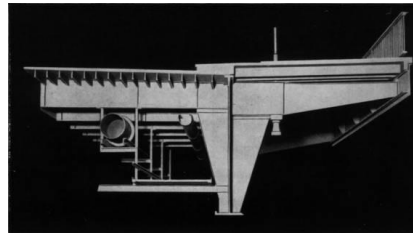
Segment of the steel superstructure with orthotropic deck of the Rhine Bridge Cologne-Mühlheim Germany, 1951 Source: Stadt Köln (1951)
